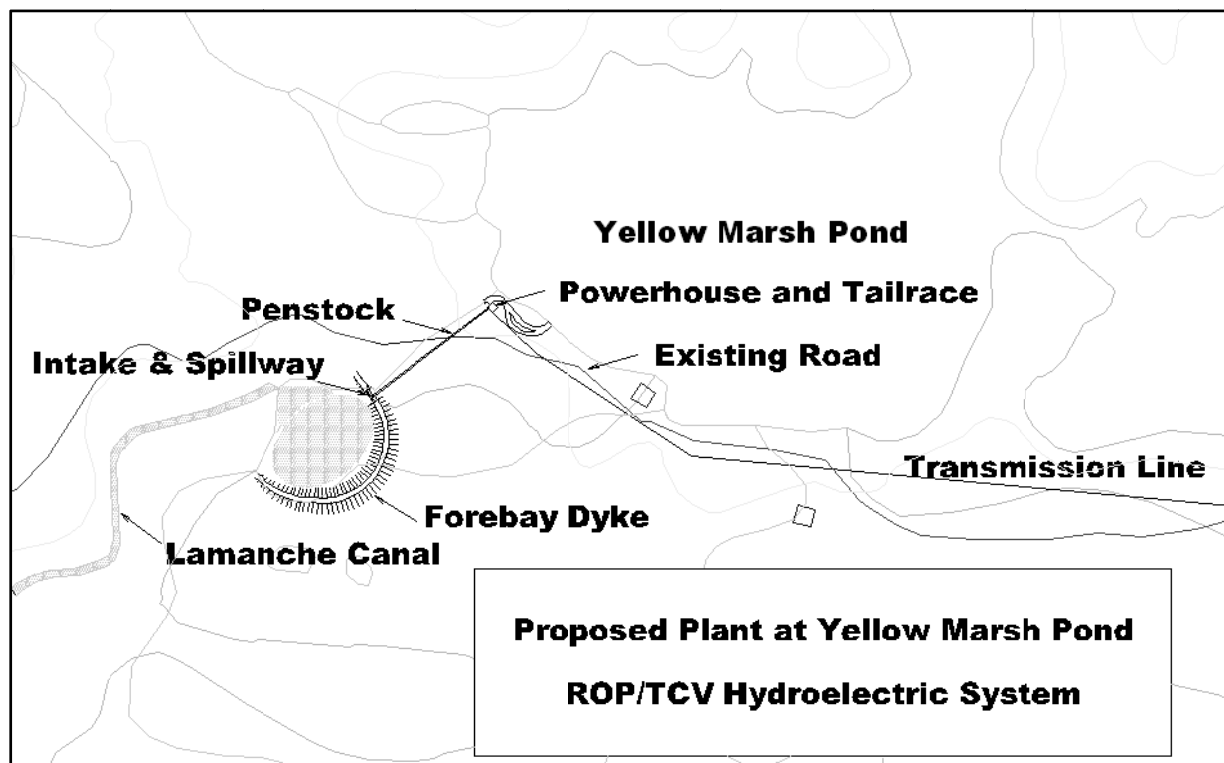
Conceptual Layout of a Proposed Development at Yellow Marsh Pond.
